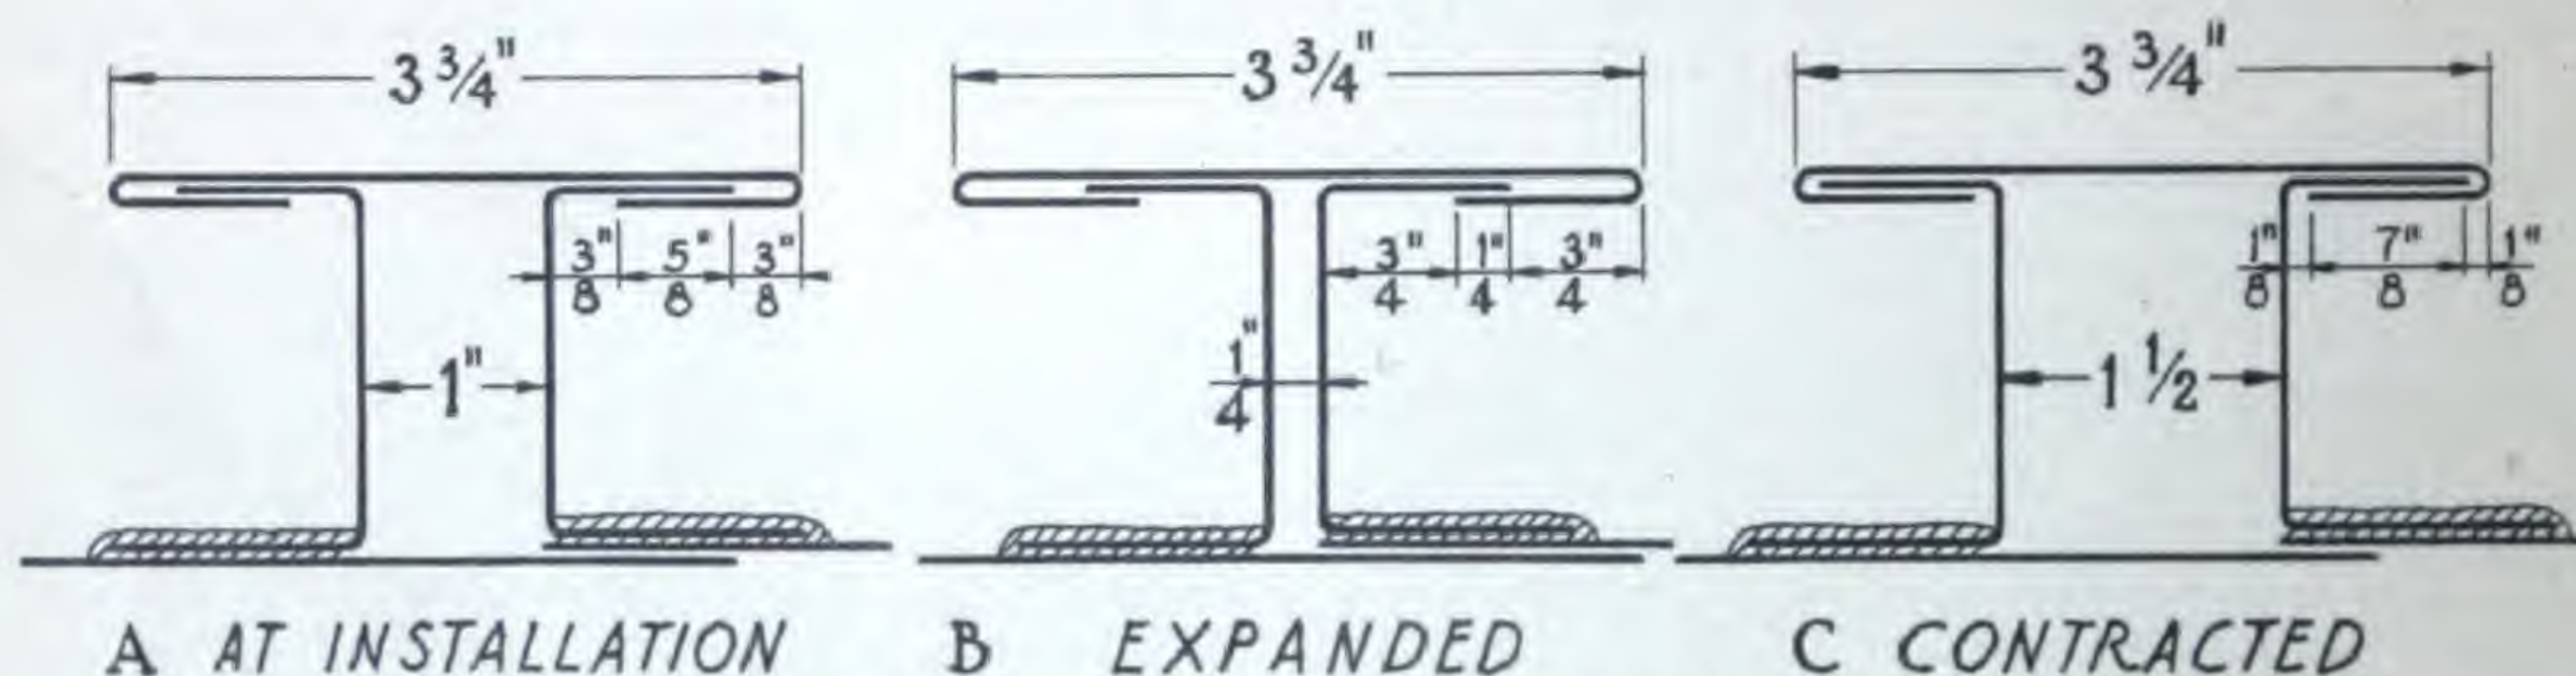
CROSS-SECTIONS OF AN EXPANSION JOINT
